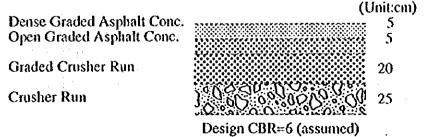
Standard Cross Section of Yard, Apron, Road
